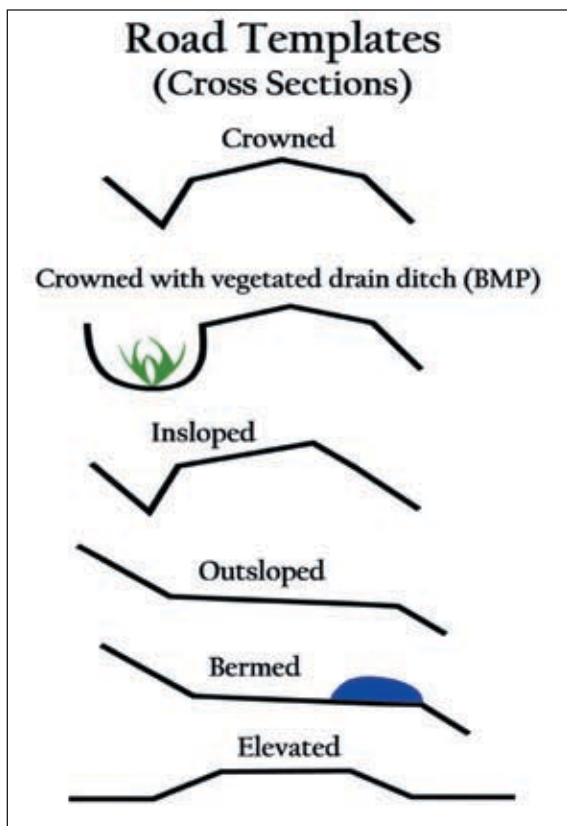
Alternative cross sections used to assure sufficient cross sloping and drainage.
